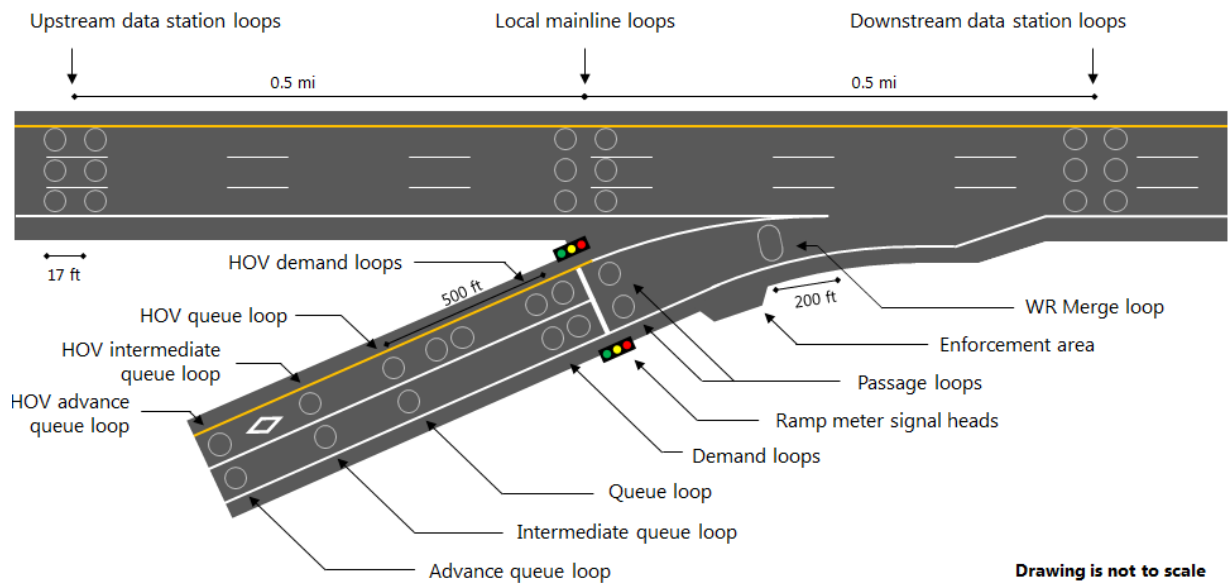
Typical ramp meter layout with HOV ramp metering
